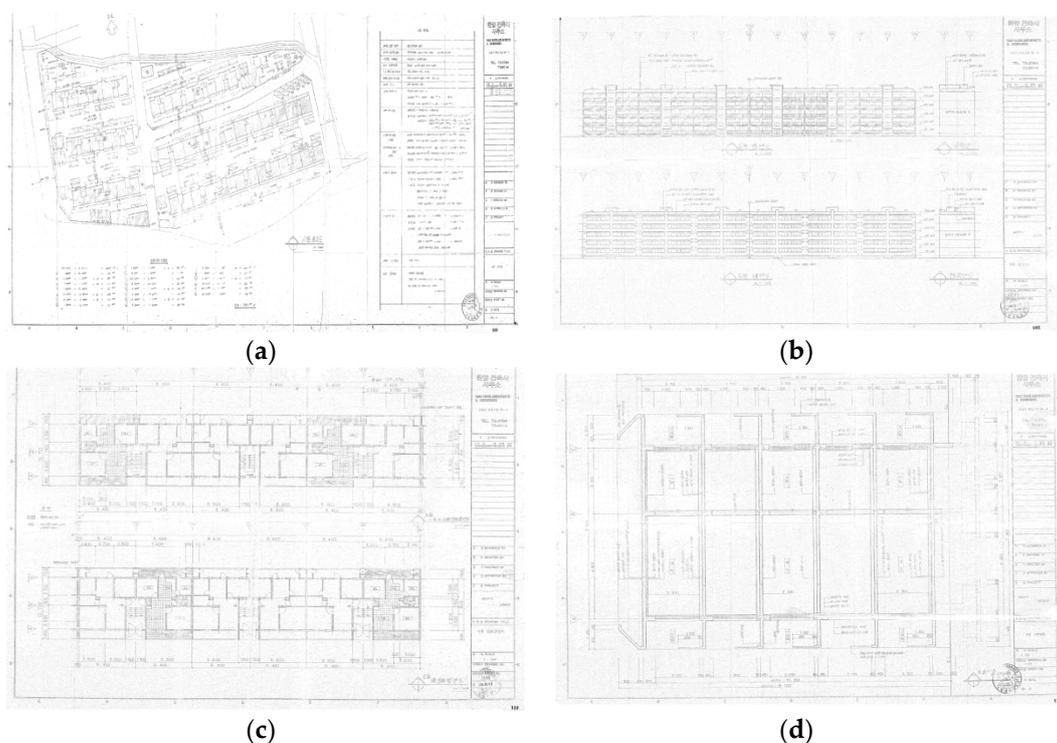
Layout of the Daeseong Apartment Complex and drawings of Building E. (a) Layout of the complex; (b) Elevation of Building E; (c) Floor plan of Building E; (d) Sectional view of Building E.
